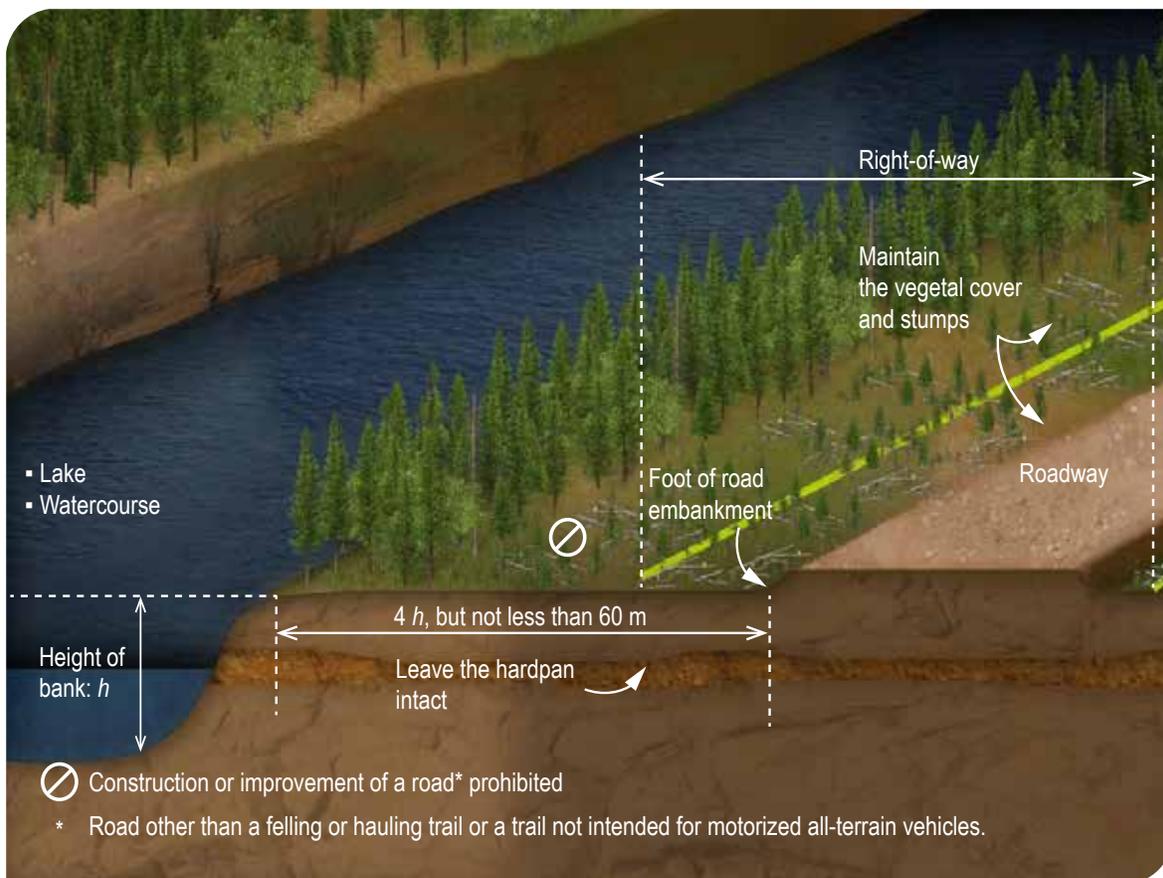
B Rules governing the construction or improvement of a road located near a lake or watercourse, on soil that is impervious hardpan
